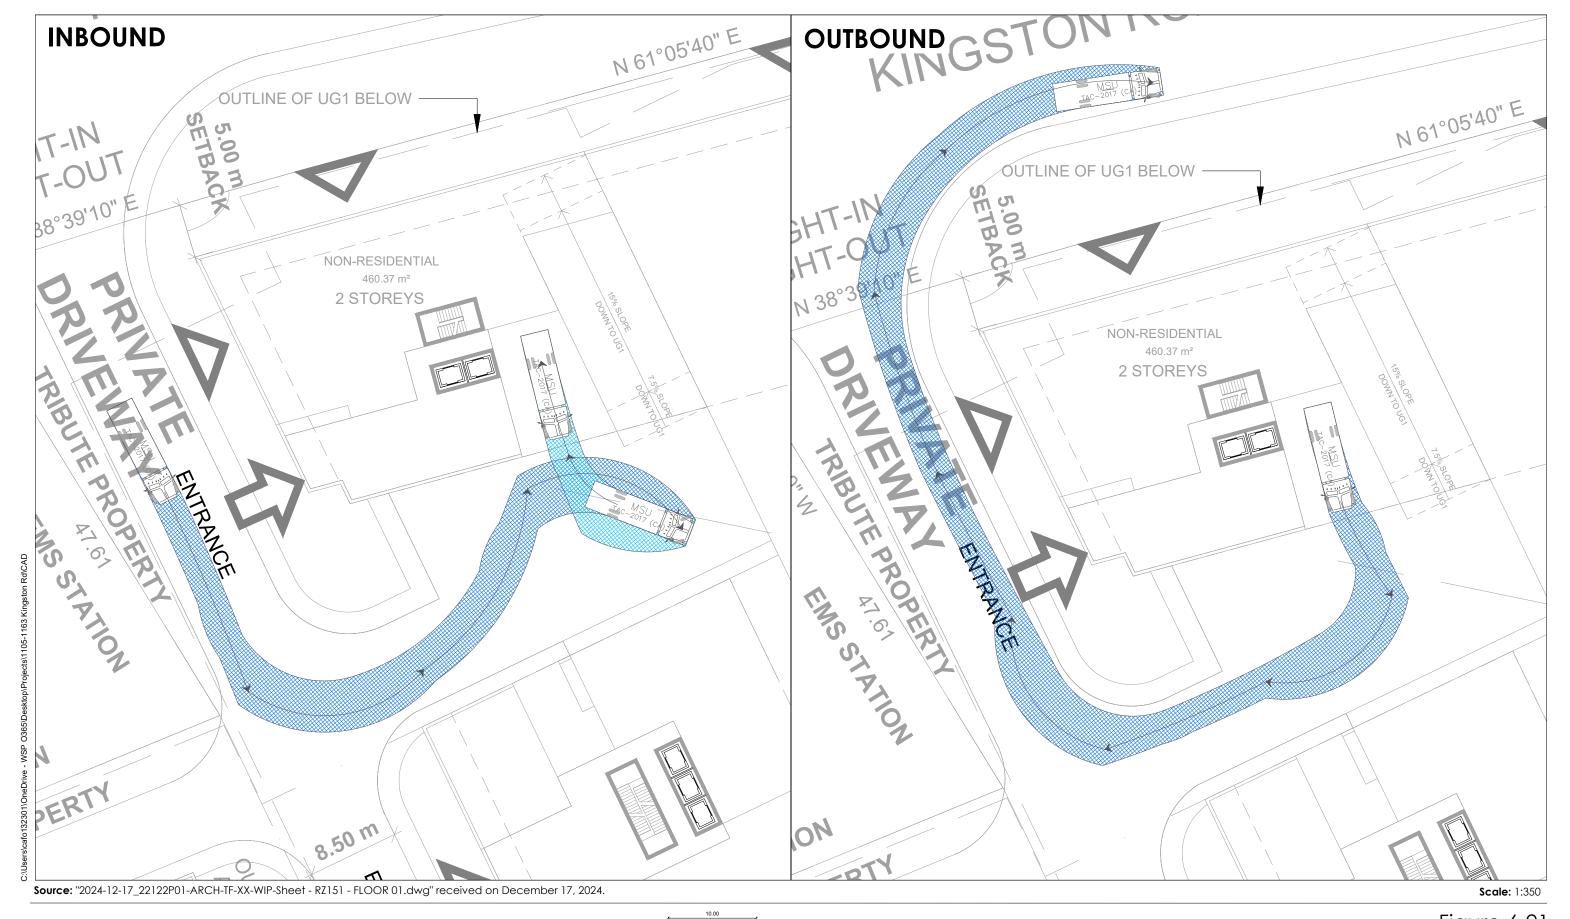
MSU Loading Truck Turning Maneuver - Building A - Retail Space 1 1105-1163 Kingston Road, Pickering
